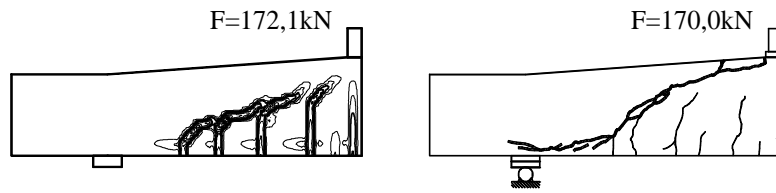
Crack propagation at failure of test beam 2K2 from Non-FEM and test
